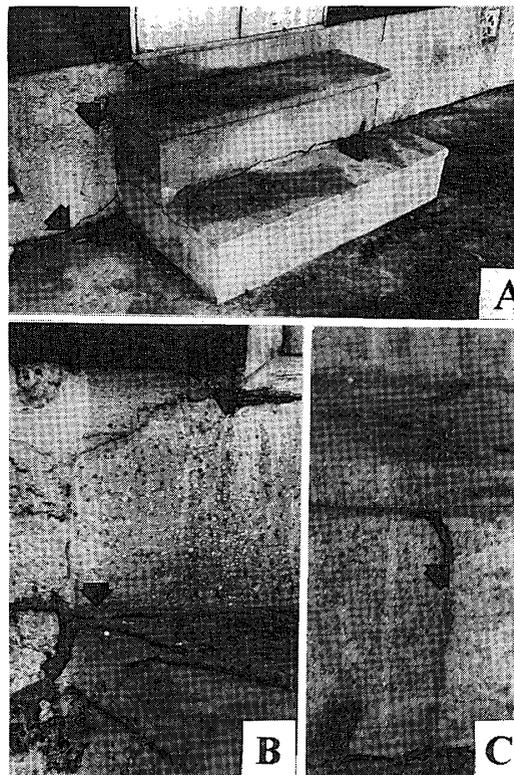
Case inspection in crawl space house in Nonthaburi Province showing the point of termite entry to wood structure (A) by penetrating their shelter tube through cracks in step or small gap between concrete foundation and step (B, C).
